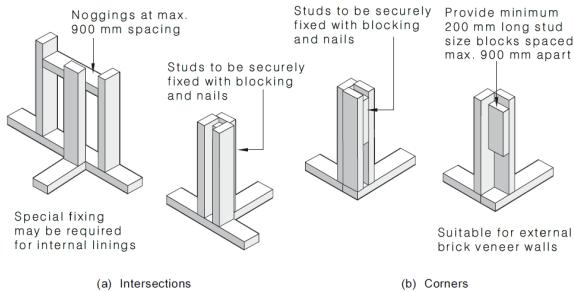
TYPICAL WALL JUNCTIONS
